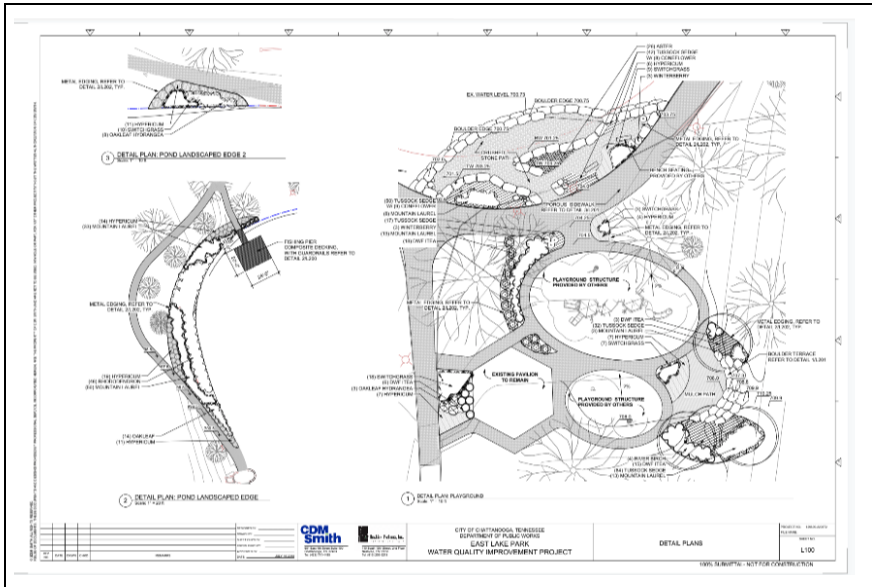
Detail plan showing hardscapes and pond's edges, proposed park design. Source: CDM Smith.
